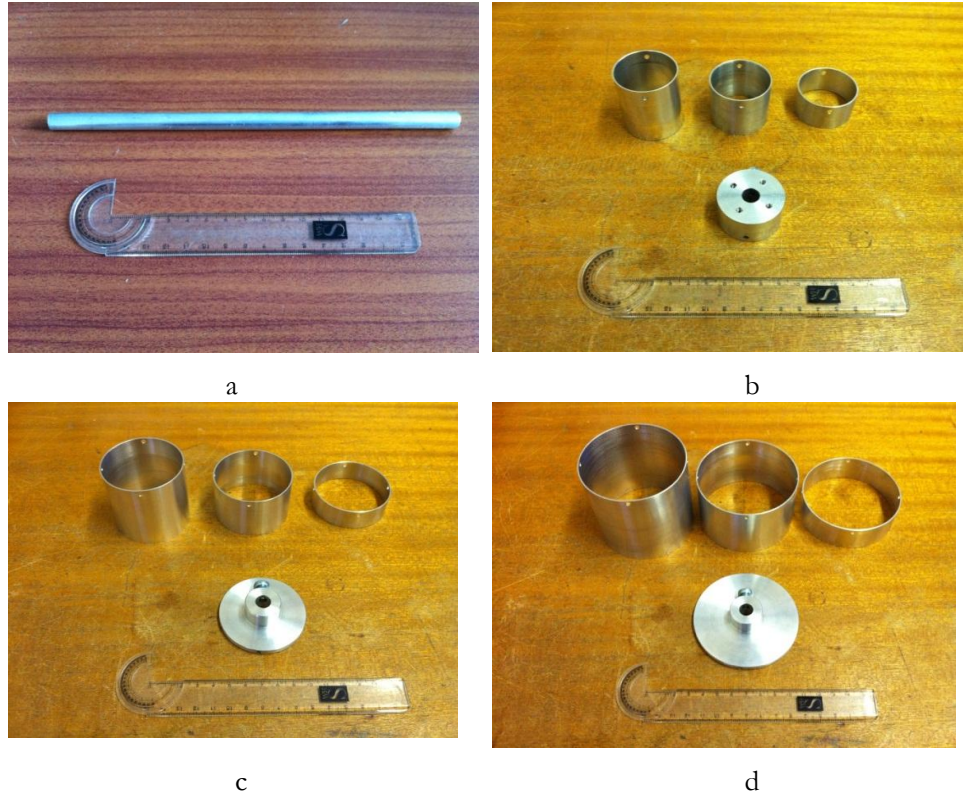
Model hybrid foundation system; (a) Pile (b) F40 footing and skirts (c) F60 footing and skirts (d) F80 footing and skirts.
